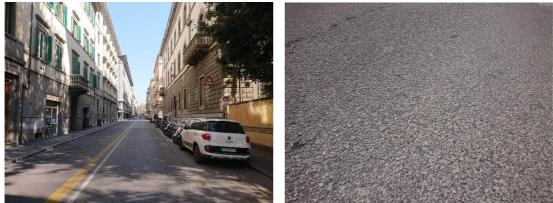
Current state of site 1 (close to the Castelnuovo High School)
